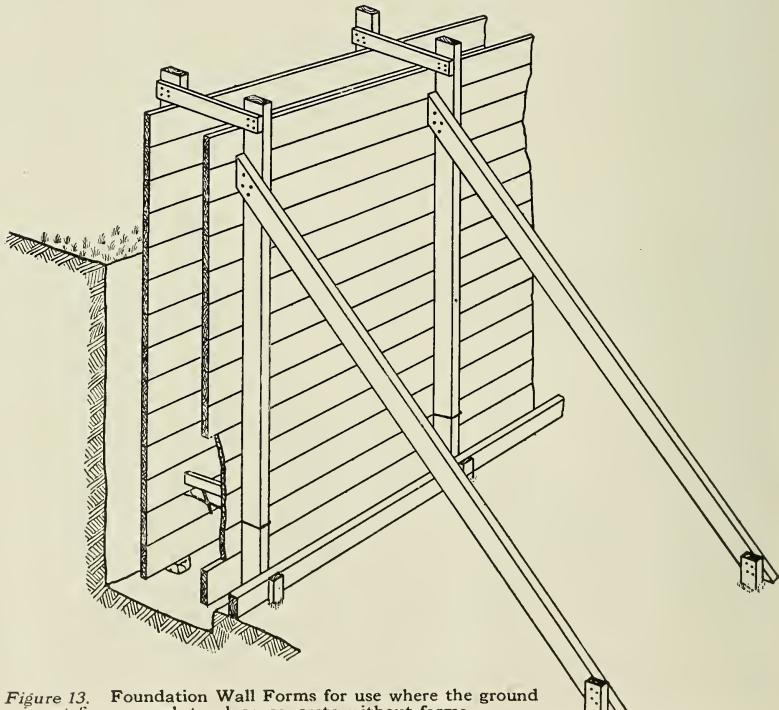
Foundation Wall Forms for use where the ground is not firm enough to place concrete without forms.
